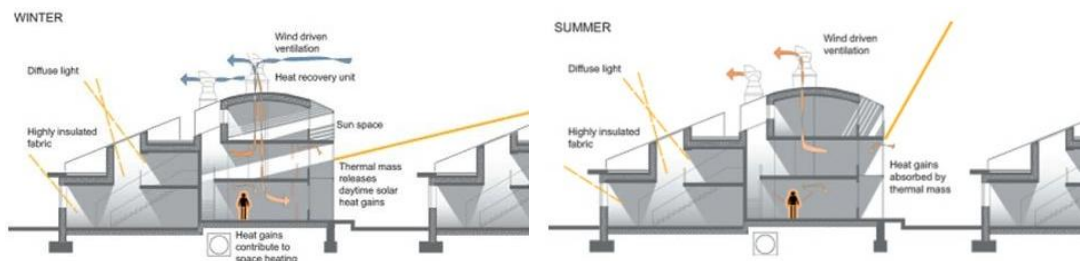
Wind cowls work enhance the ventilation within the building
